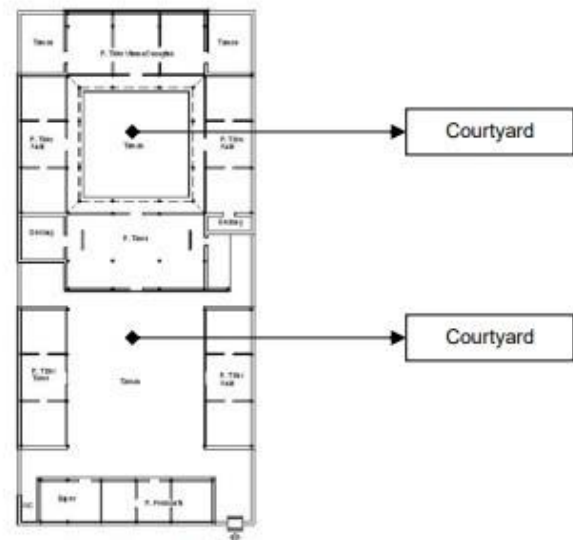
Traditional Chinese Building Floor Plan (Source: Handinoto, 2008)
